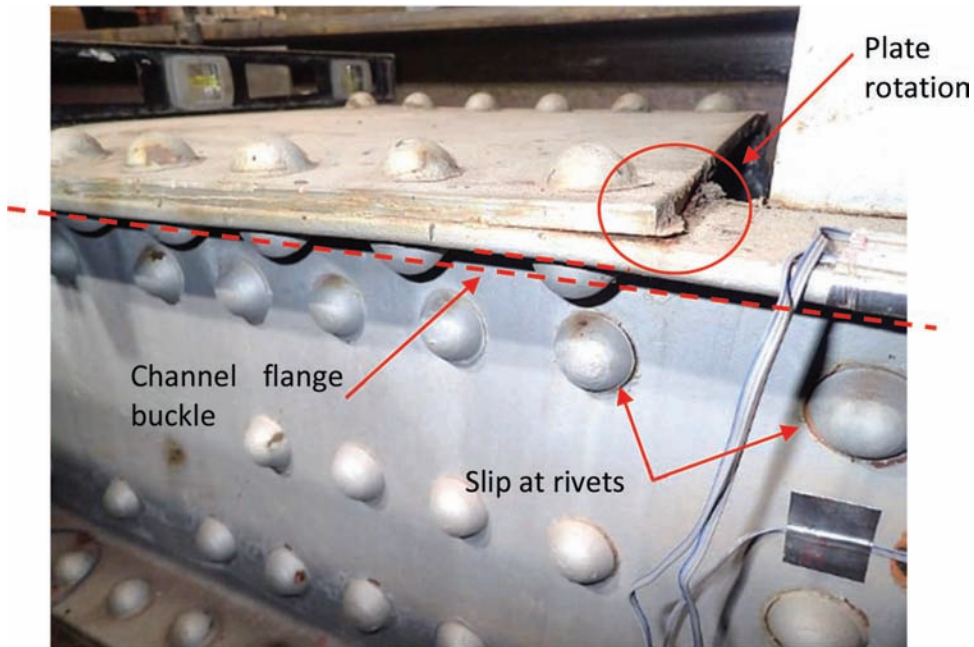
Specimen 1 after testing was completed showing buckled channel flange, slip at the rivets, and rotated end stay plate.
